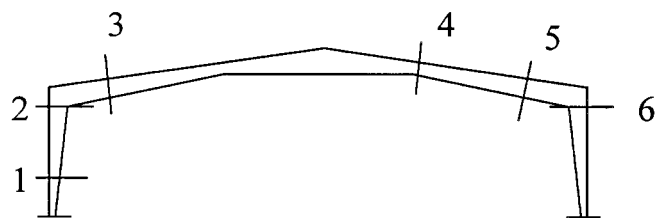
Schematic View of Typical Frame, with Designation of Cross Sections
